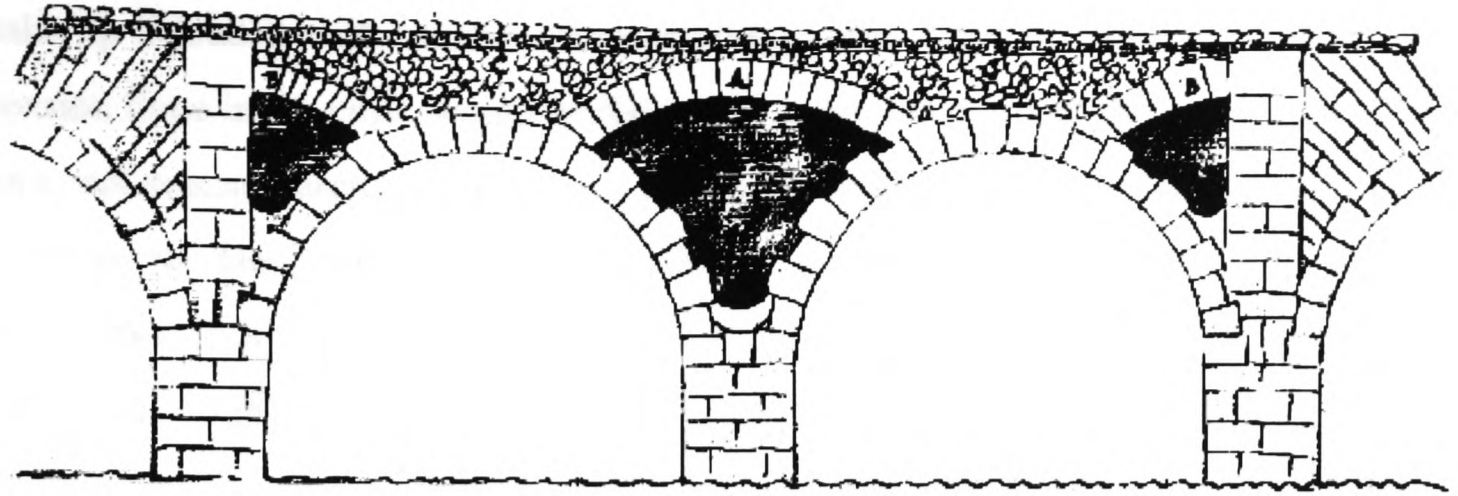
Westminster Bridge: William Stukeley's proposal for relieving the sinking pier, 1748 (Walker, 1979).
